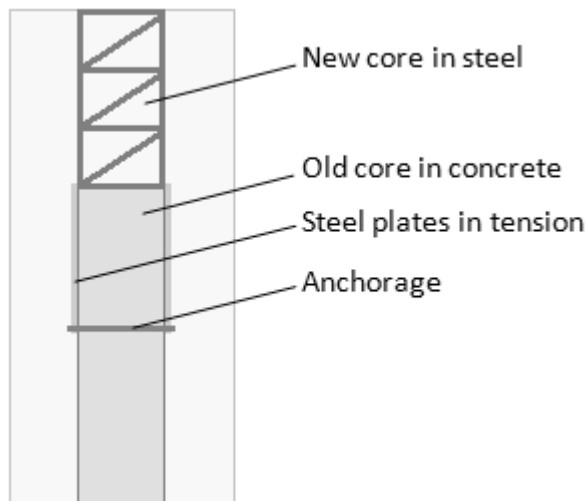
Principle for anchorage of the new core in Gothia Central Tower.
